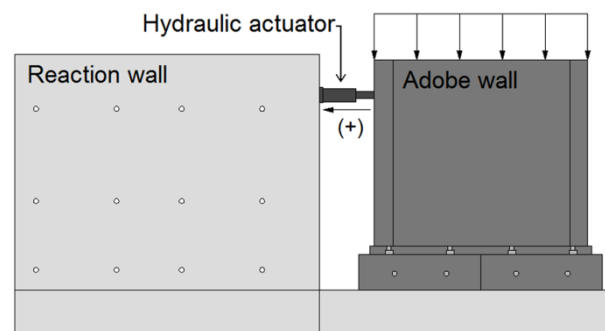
General scheme of the test set-up (adapted from Pereira (2008)).
